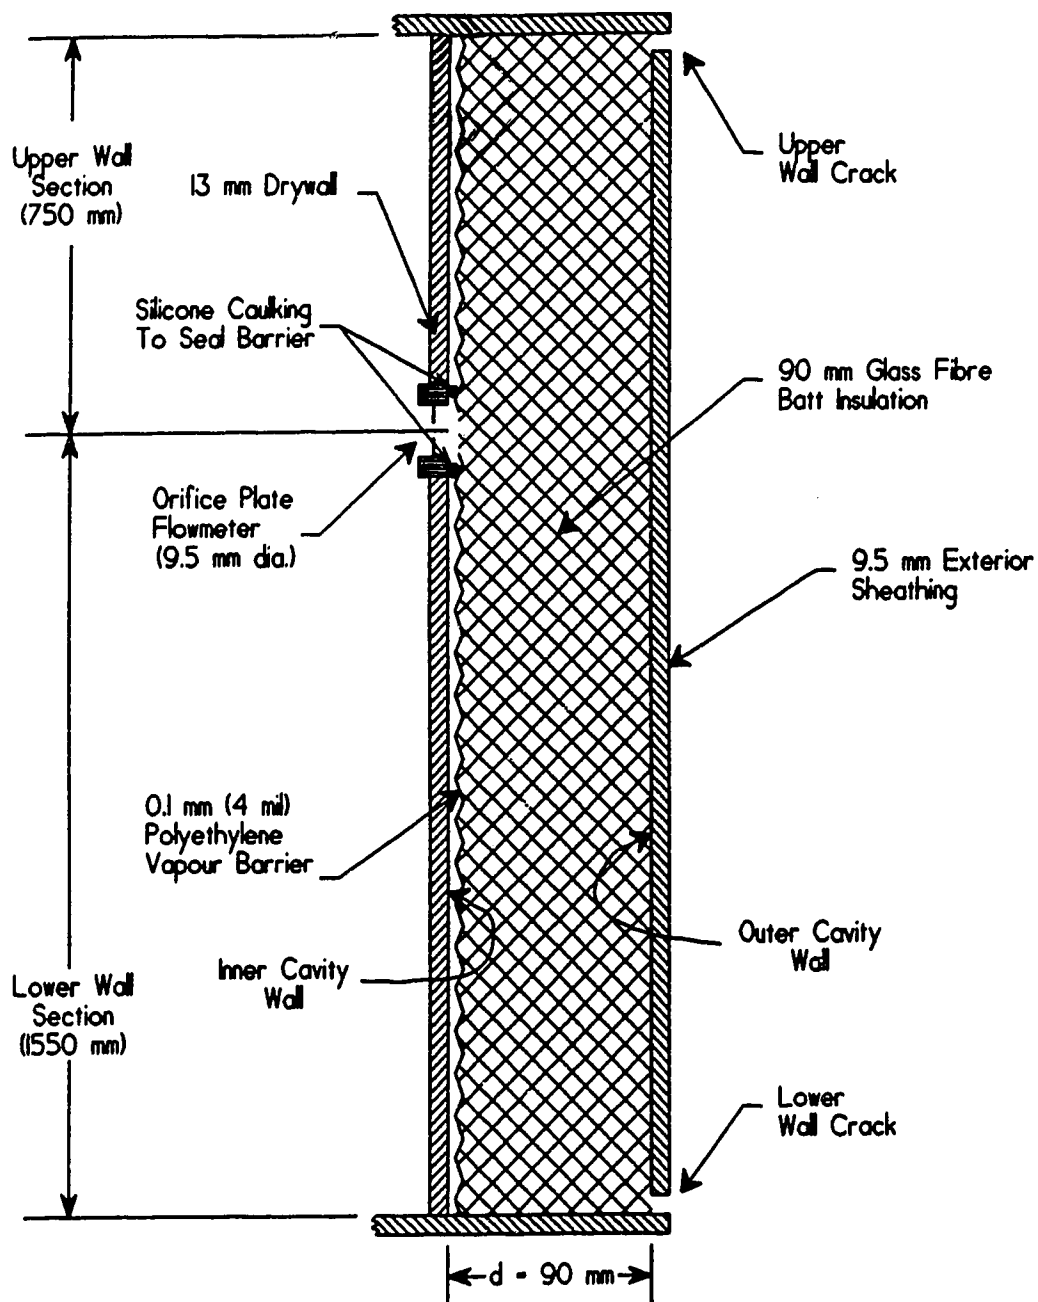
Side view and construction details of the north wall test panel. The annular slit orifice plate flowmeter acts as the exfiltration site on the interior wall of the test panel.
